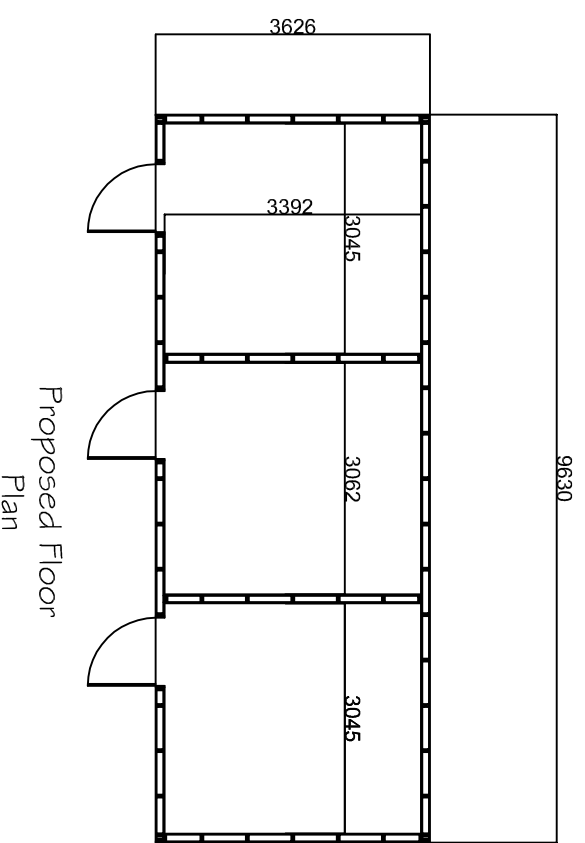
of 7 Proposed Small Open Fronted Horse Shelter
